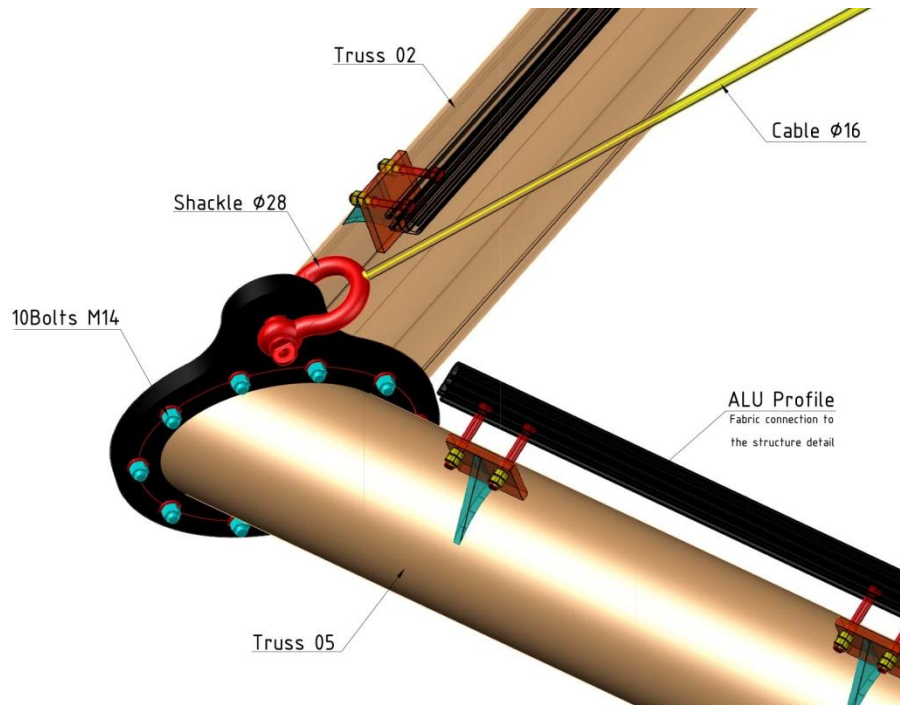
The above image shows the detail in 3 other corners of structure, Truss 02 and 05 connect to each other with flange.
